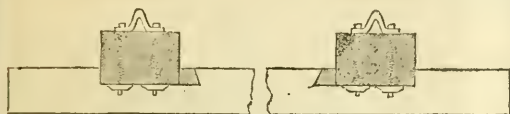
Section of longitudinal timbers, wedges, and rails.
